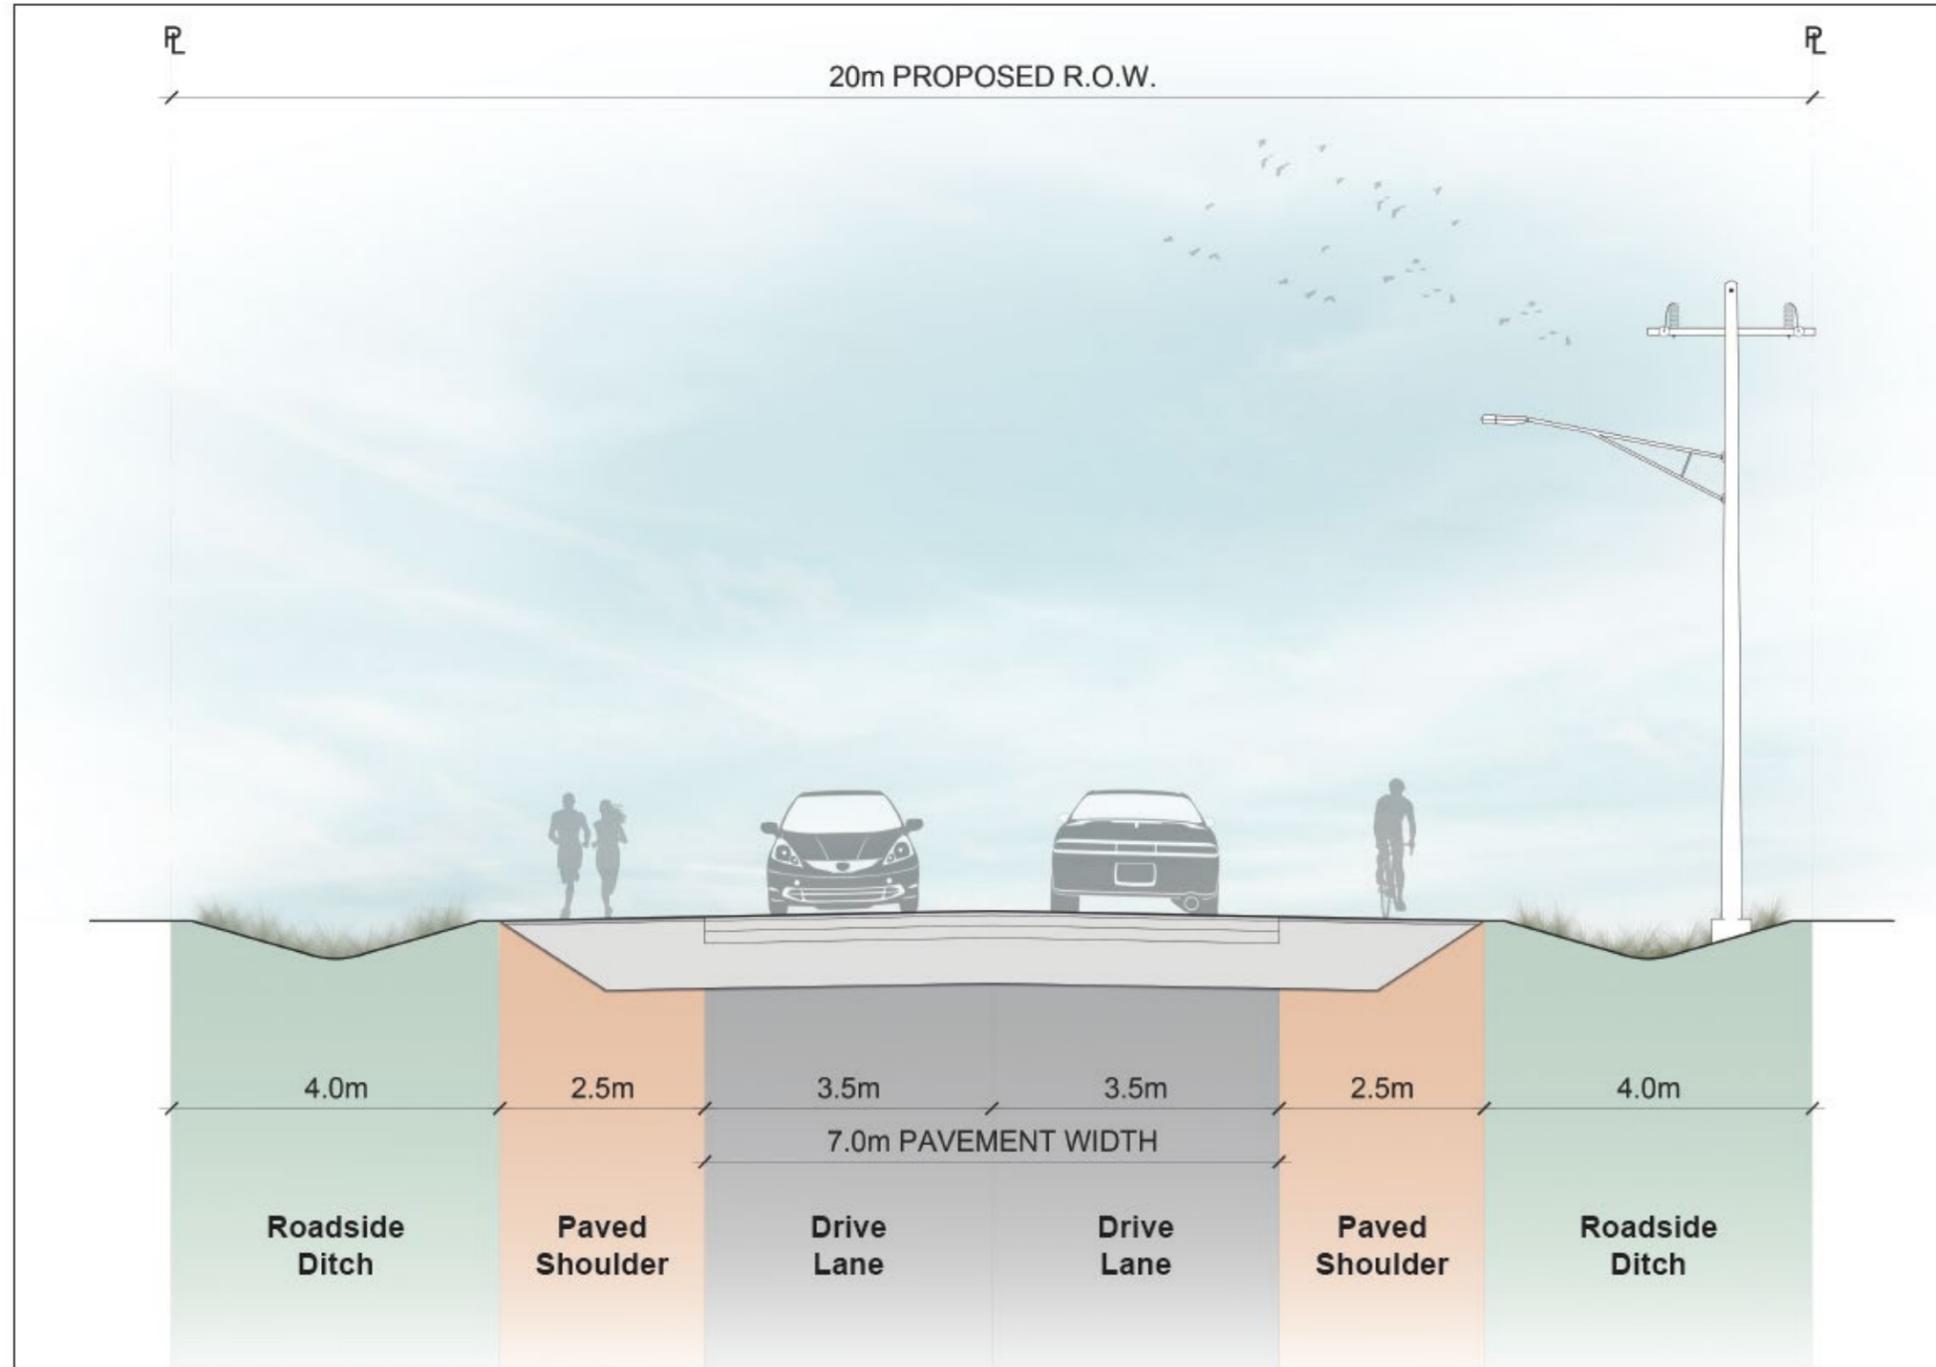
Neighbourhood Connector Street (Rural) – Conceptual Application B (New Road)
